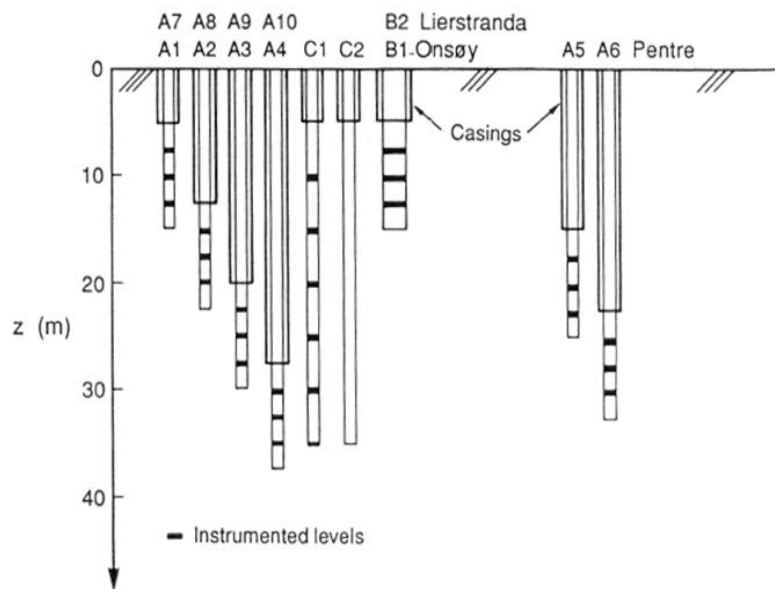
Test piles used at Onsøy, Lierstranda and Pentre test sites
